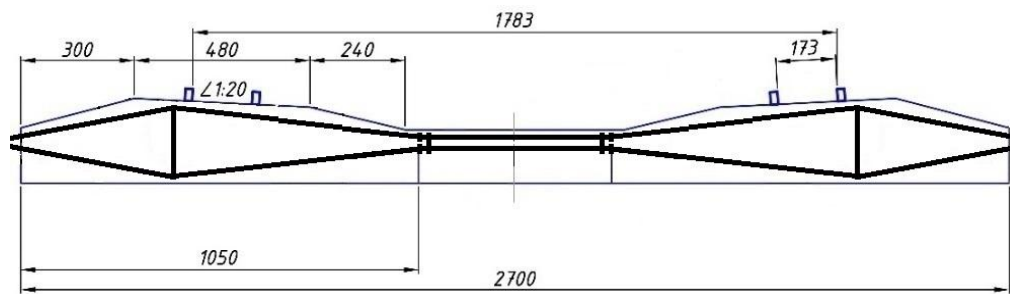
The sleepers for anchor rail fasteners with an extended reinforcement
